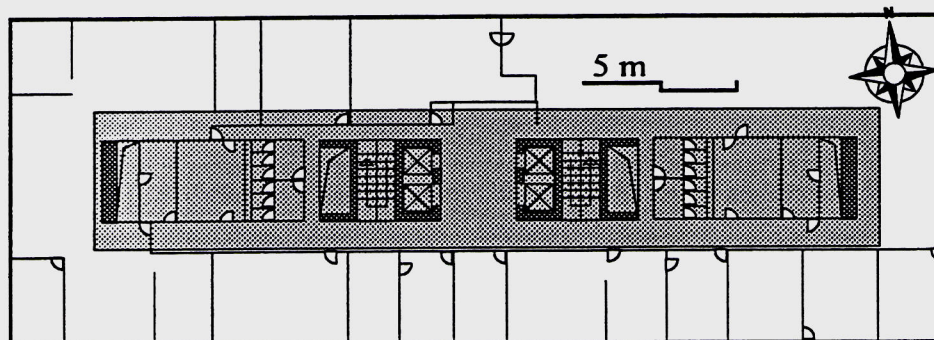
Building H: plan of measured floor. Grey zone is the central zone, ventilated with partly recirculated air.
